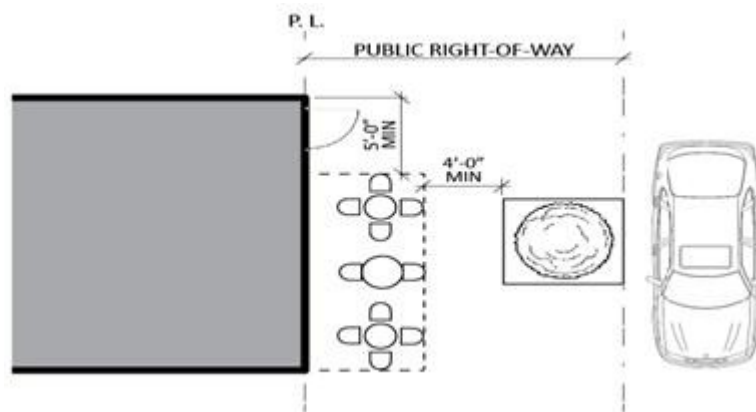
Example of an outdoor dining area in the public right-of-way abutting a storefront wall without a barrier.
